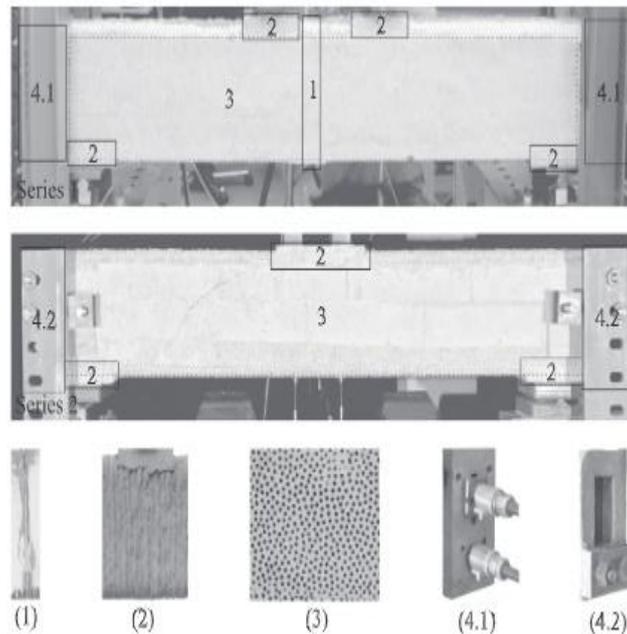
Test preparation steps for Series 1 and 2: (1) Glueing of two segments(Series 1 and B-231-F06); (2) Mortar beds; (3) Gypsum surface painted white and speckled; (4.1) Post-tensioning reinforcement with anchorage plate and force measurement (Series 1); (4.2) Passive reinforcement with anchorage plate (Series 2).
